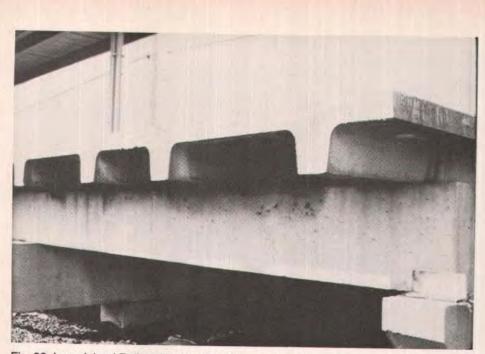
Long Island Railroad grade crossing elimination, Wantagh-Seaford platform tee beams.
